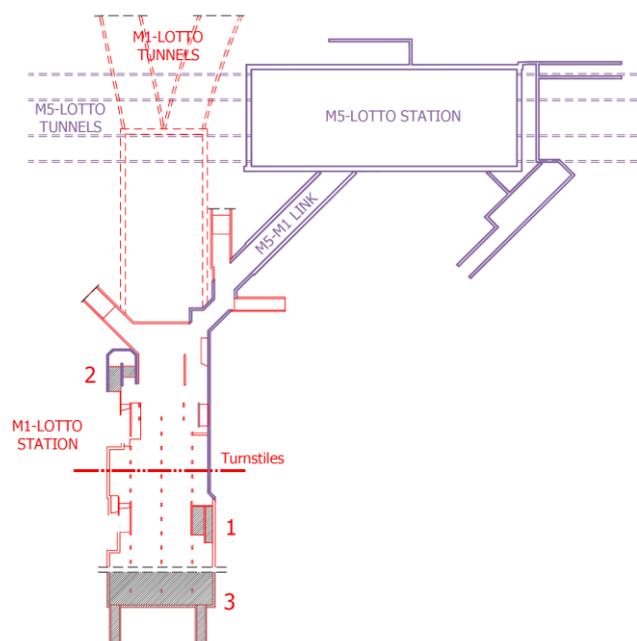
Planimetric overview of the Lotto station, indicating the existing and the new constructions
